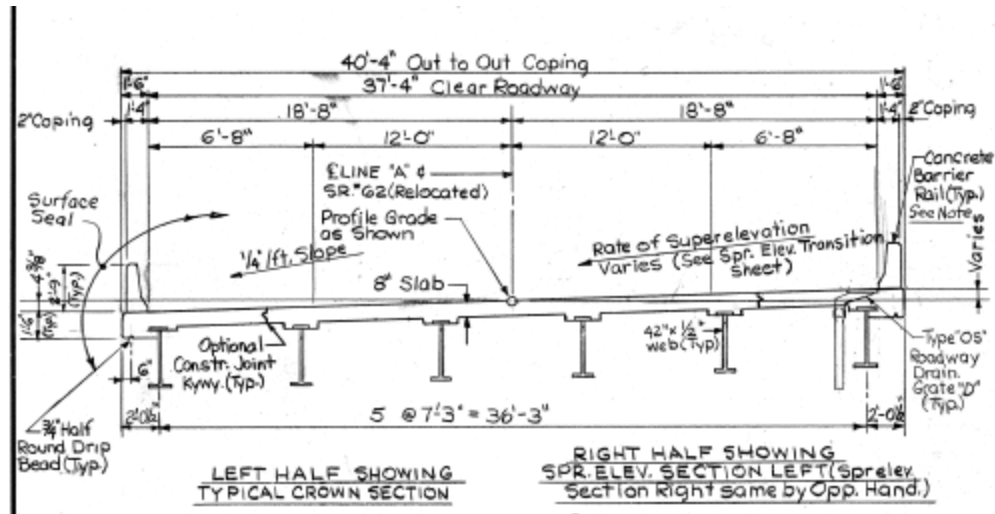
Typical Section of the Bridge (NBI 22240) (1989)
